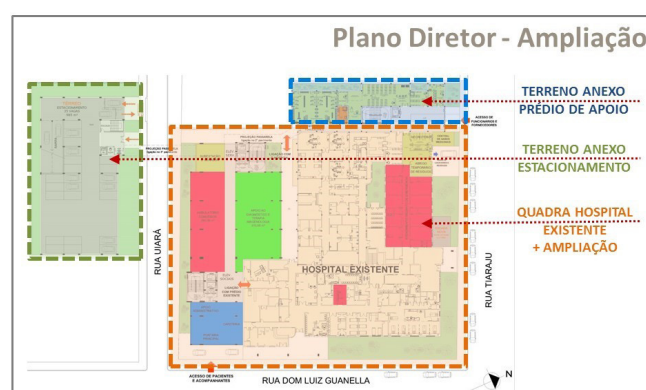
Case 1 – Hospital Master Plan for an existing hospital – Floor plan with the existing zoning of the functional unities. Source: Badermann Arquitetos, 2015.
